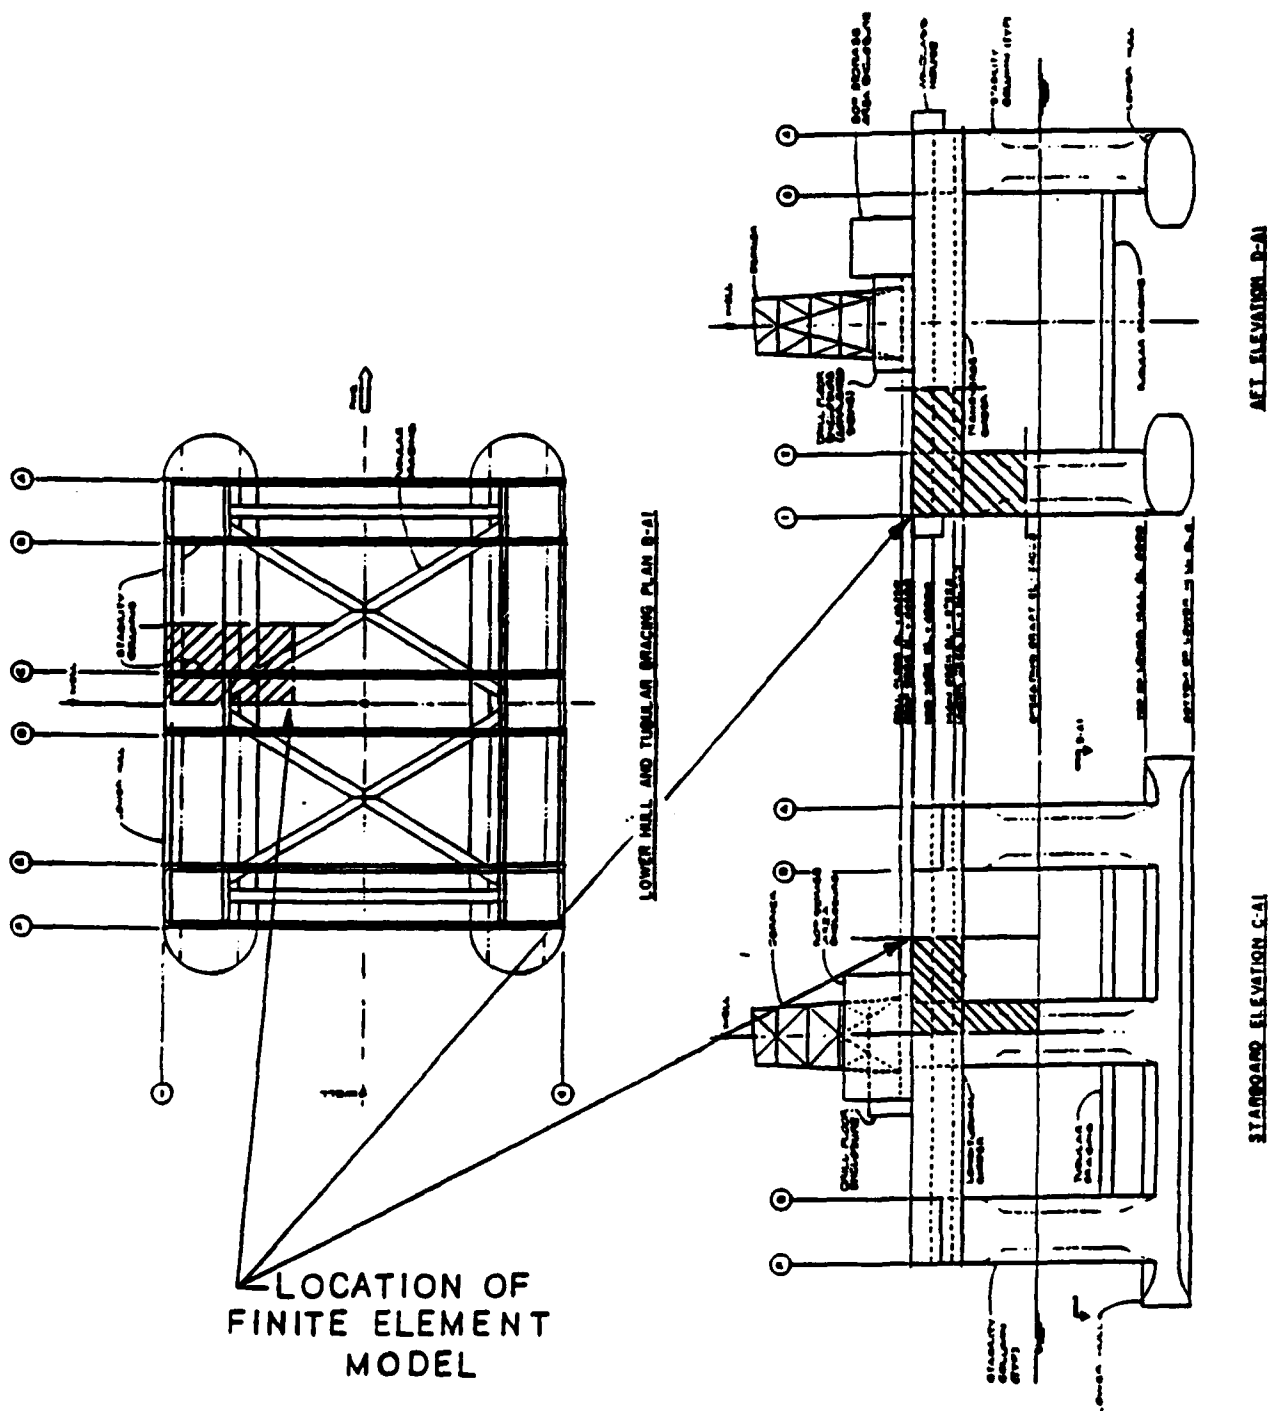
Overall Geometry of Vessel and Location of Column-to-Girder Connection
